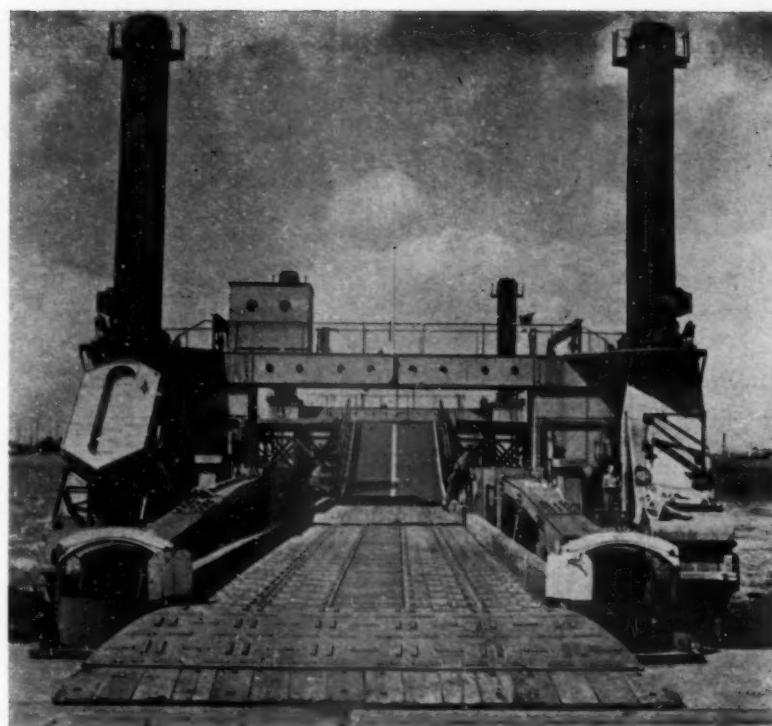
Illustrating a telescopic bridge span used for connecting unloading platforms of the L.S.T. Pier-heads.
